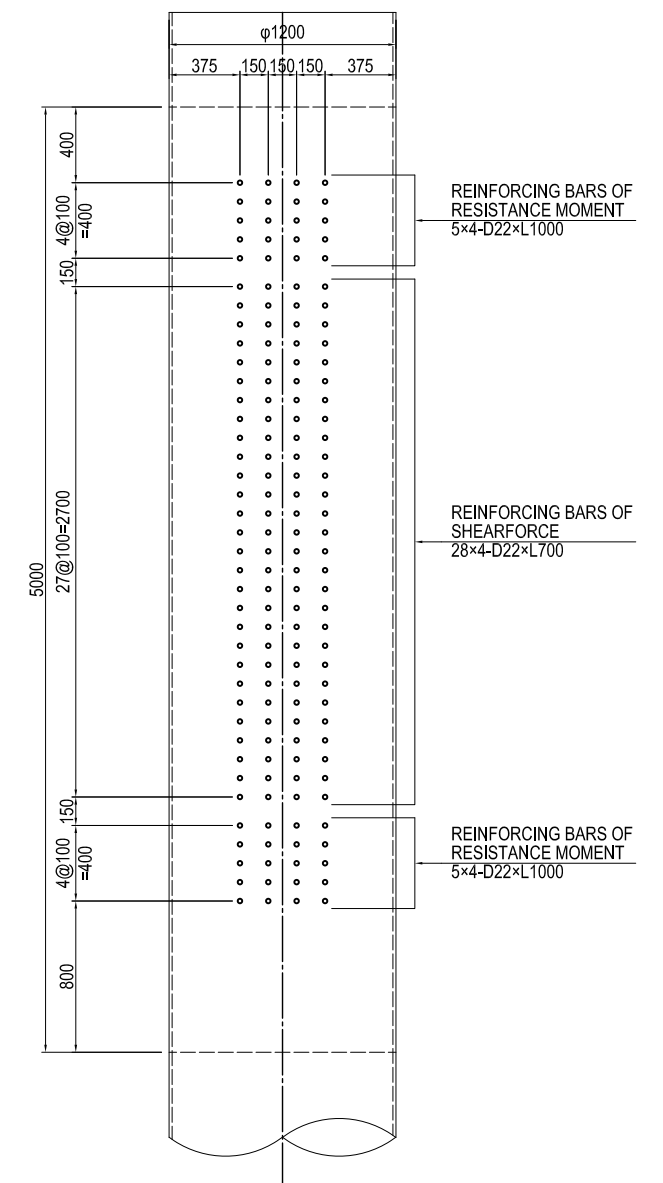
DETAIL OF CONNECTION BETWEEN STEEL PIPE SHEET PILE AND FOOTING S=1:40
